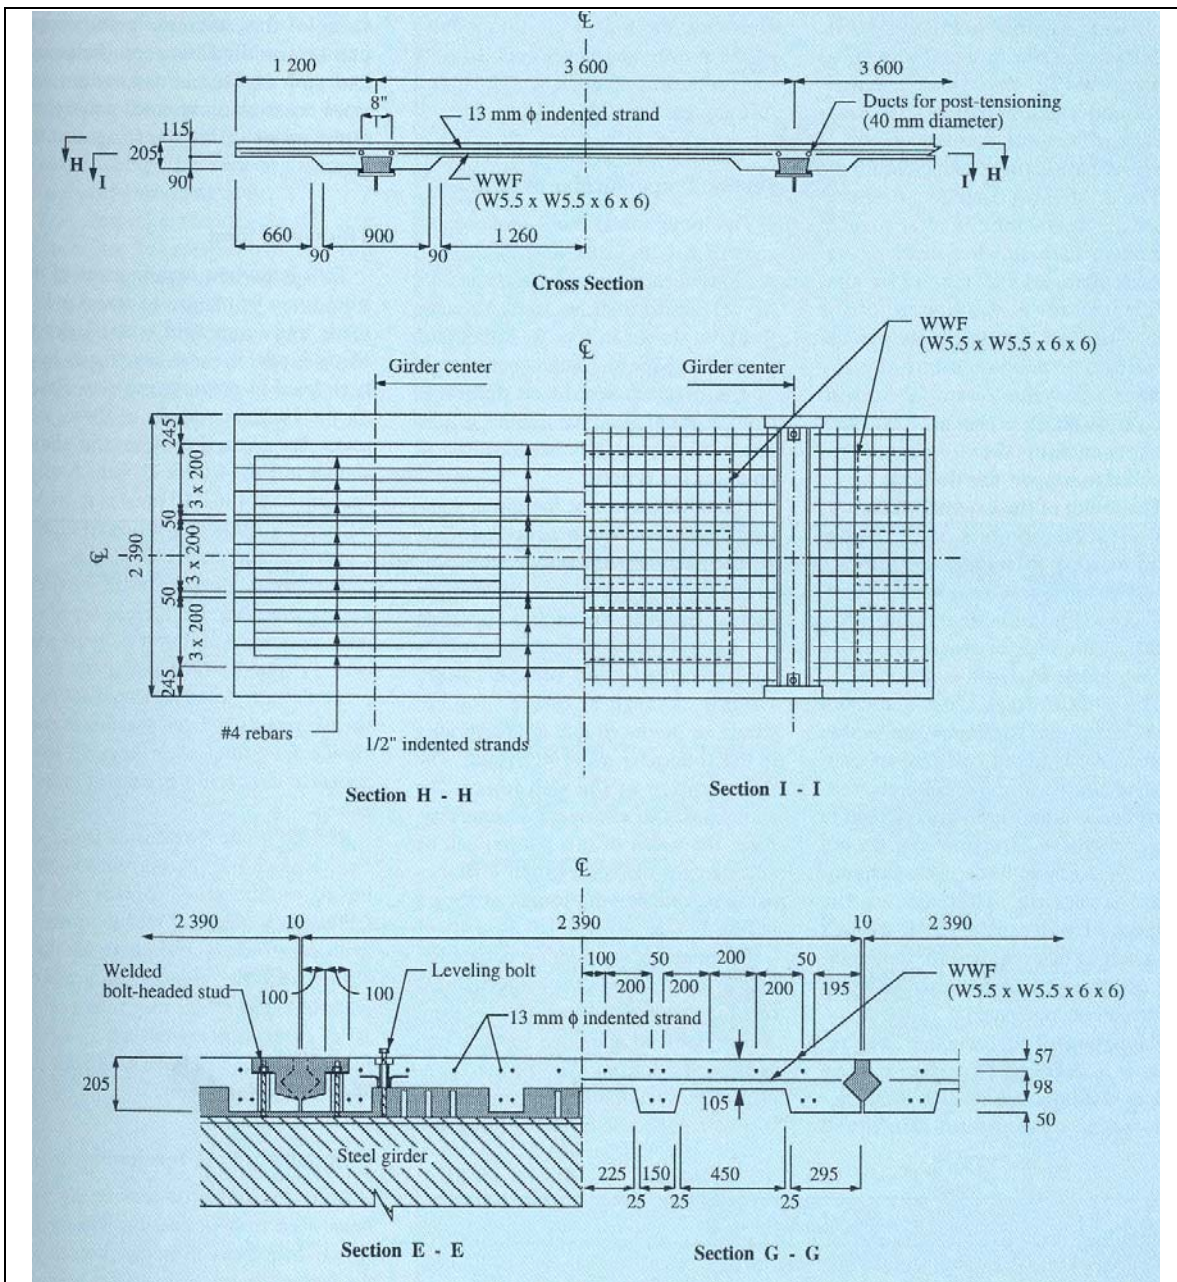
Full-depth precast, prestressed deck system general view and steel arrangement (Yamane et al., 1998)
